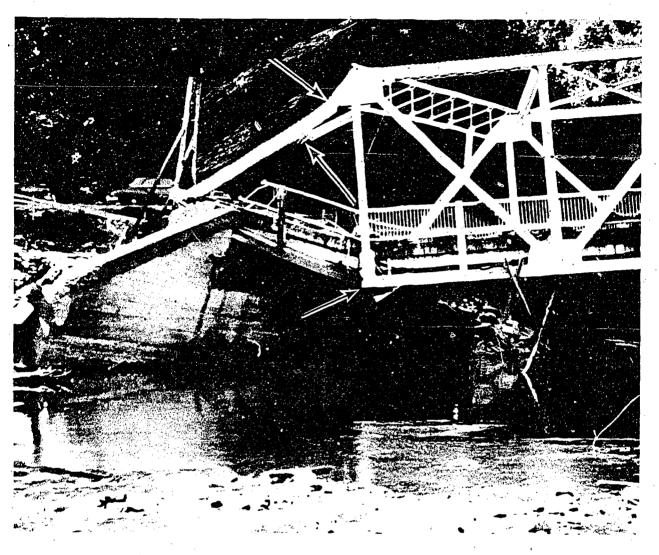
Abutment failure due to scour. Note buckling of end posts and bottom chord, and failure of portal knee brace connection.
